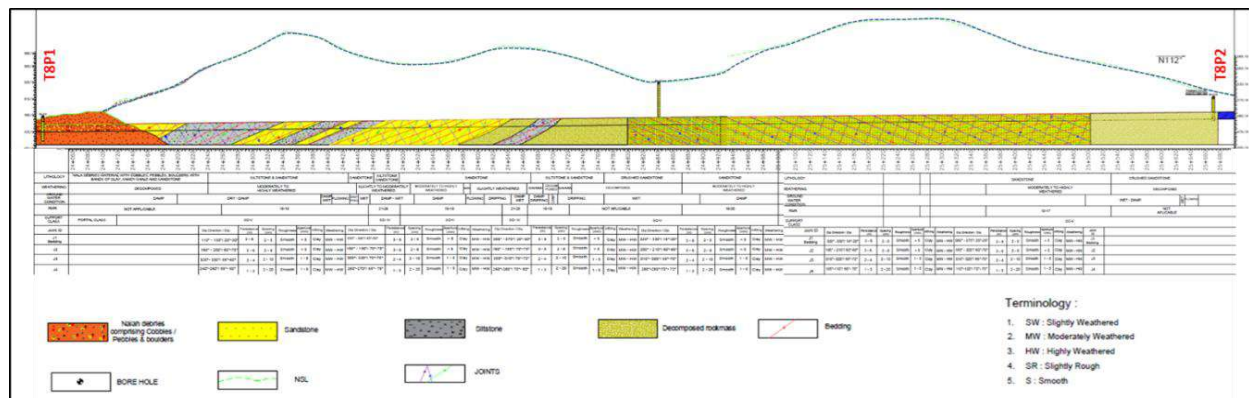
Geological L-section of Tunnel 8 as per encountered rock mass during excavation
